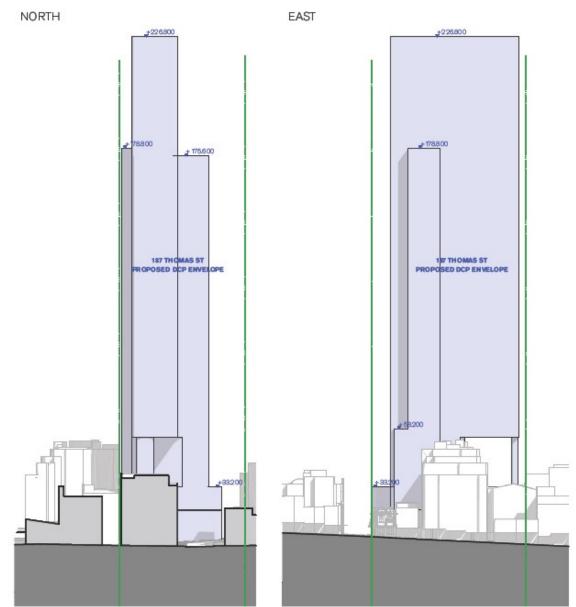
X North and East Envelope Elevations (Source: FJMT, March 2020)
